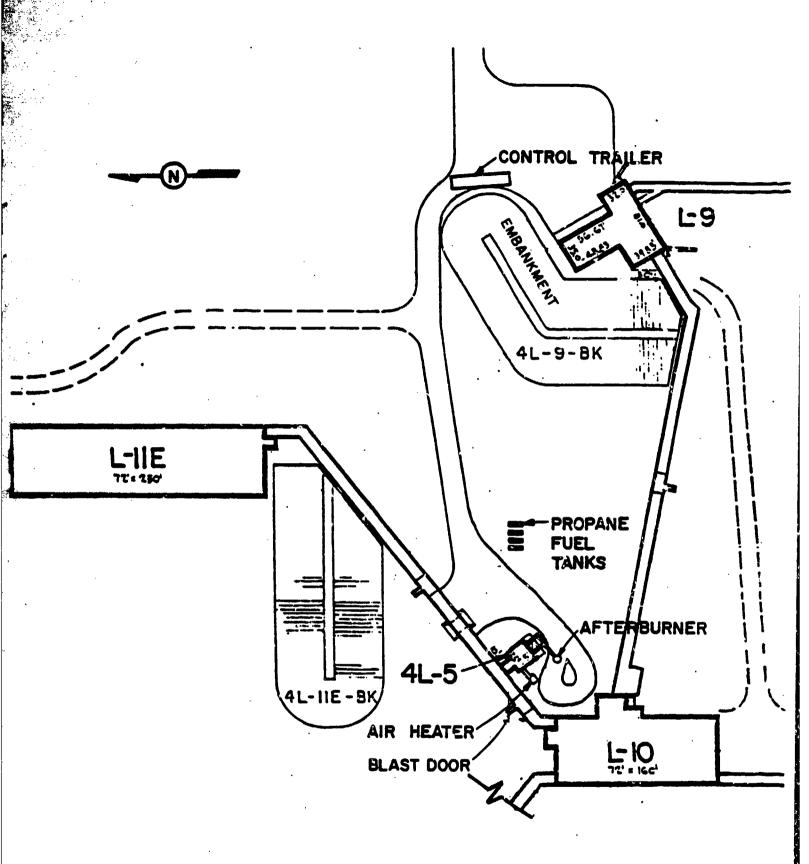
SITE PLAN FOR DECONTAMINATION OF BUILDING 4L-5
